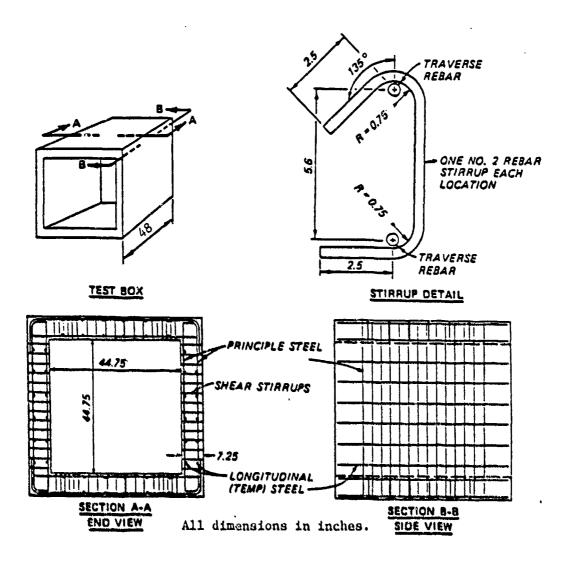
Test element construction details, Test Groups II and III (Ref. 2).
